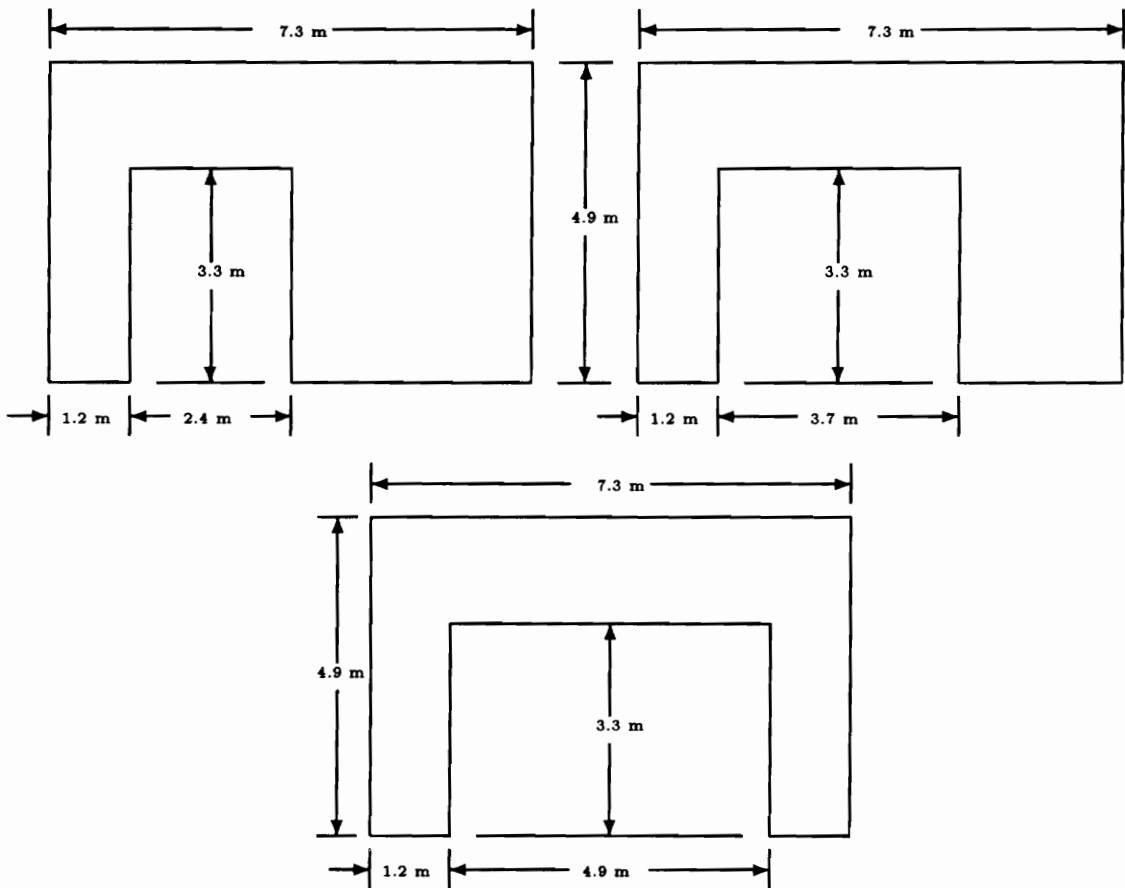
Dimensions of 4.9 m (16 ft) High Wall Models with Door Openings
